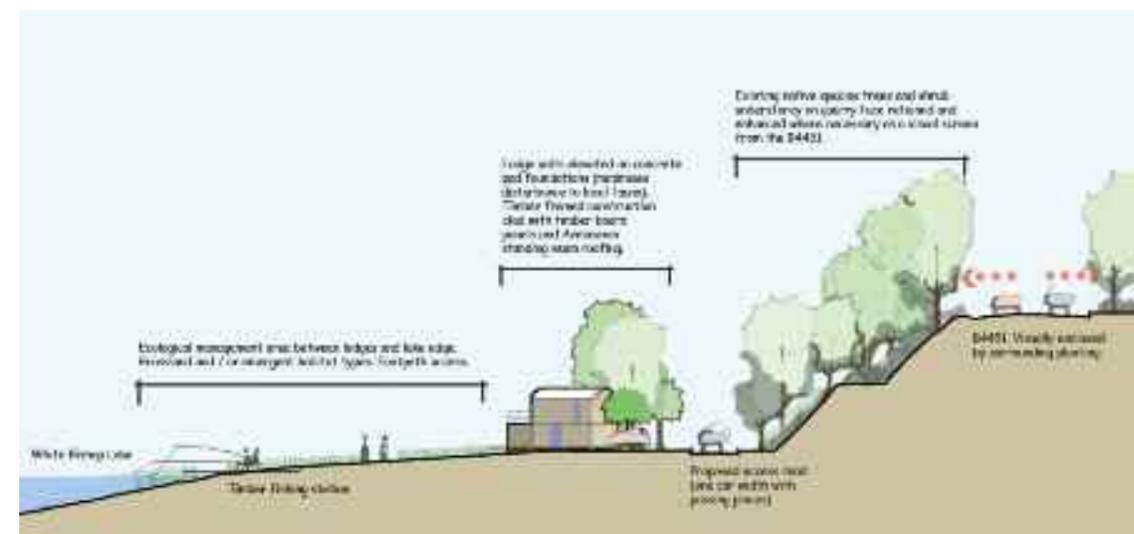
CROSS SECTION OF PROPOSED DESIGN OF FISHERMAN'S CLUBHOUSE
